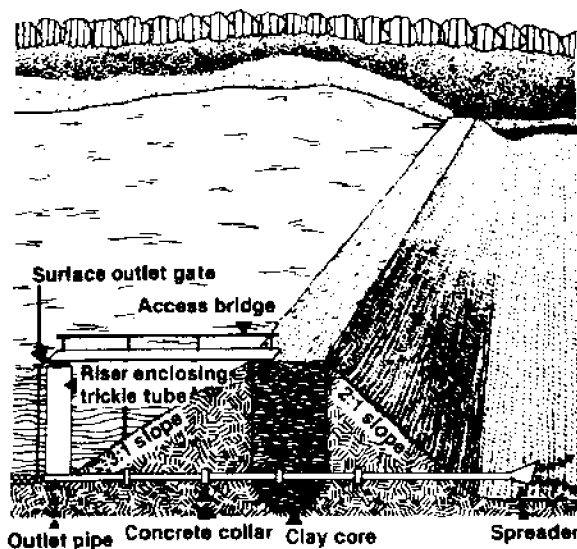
Cross section of an earthfill dam showing surface and bottom water outlet control system.
